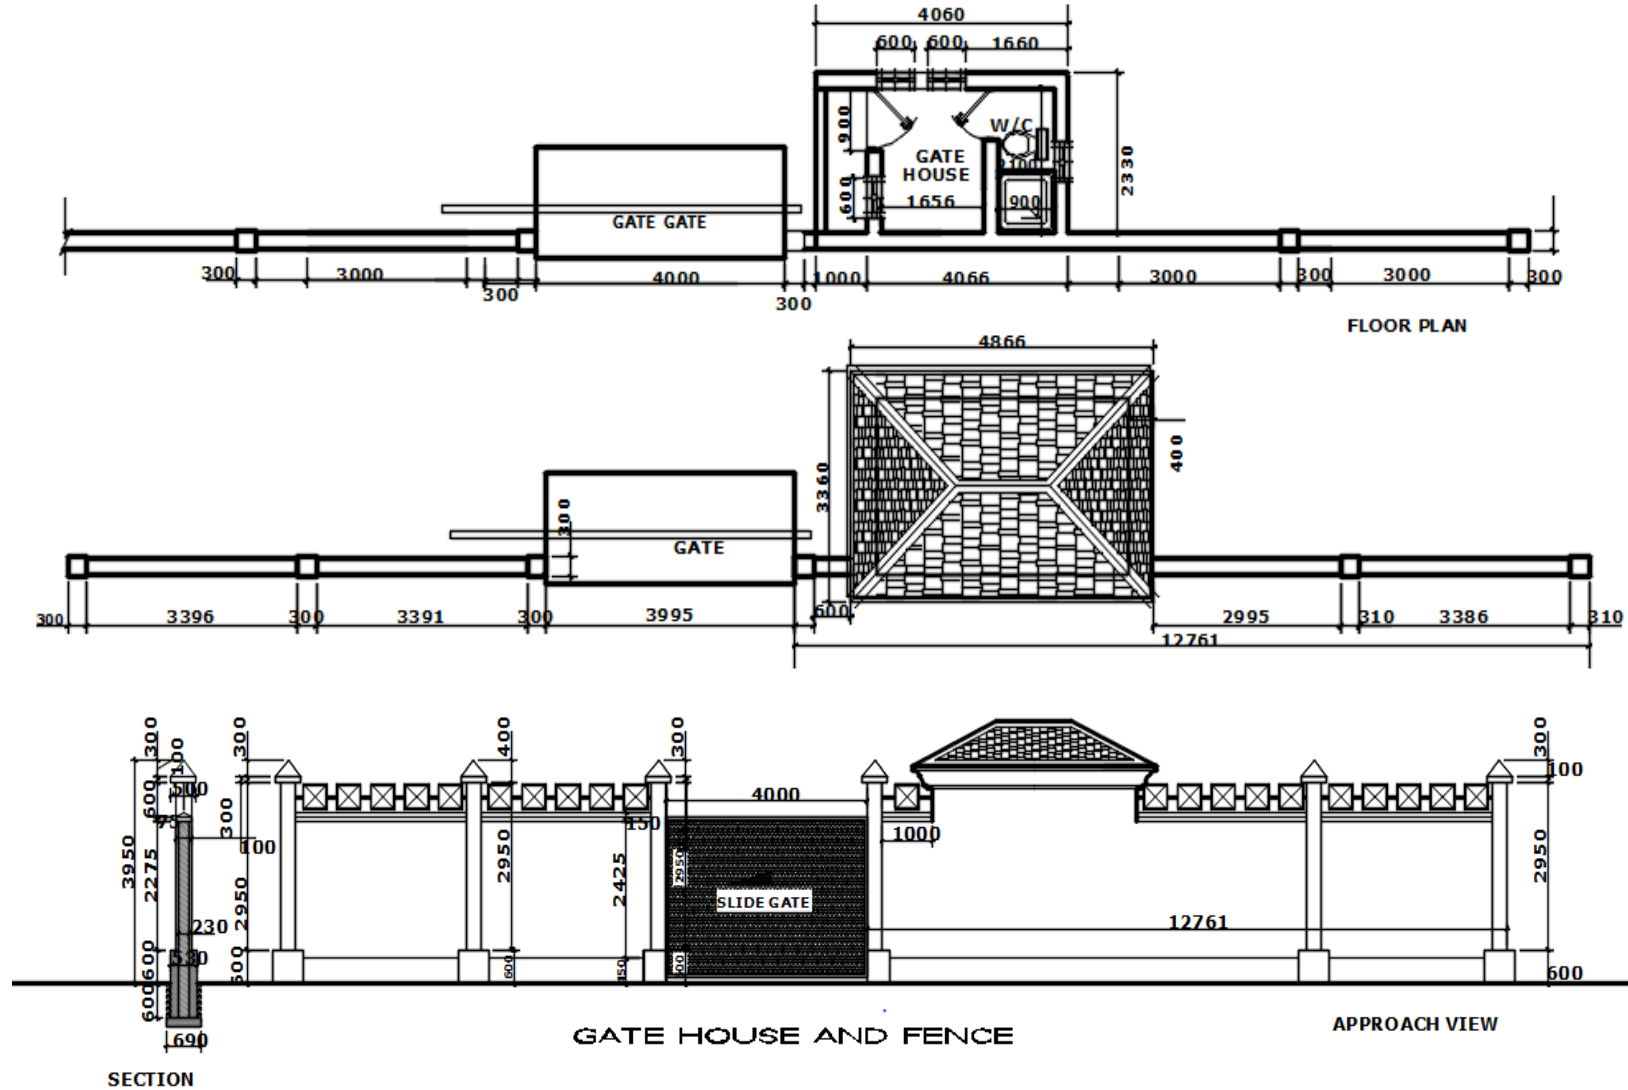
Layout of Substation Gatehouse and Fence (All Dimensions in mm)
